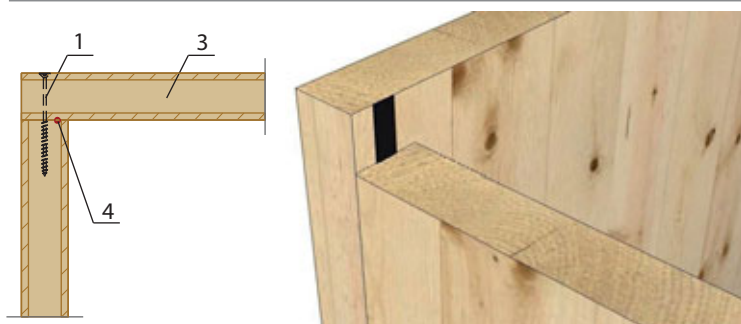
DETAIL OF CORNER JUNCTION 124, 84 – BUTTED JOINT
